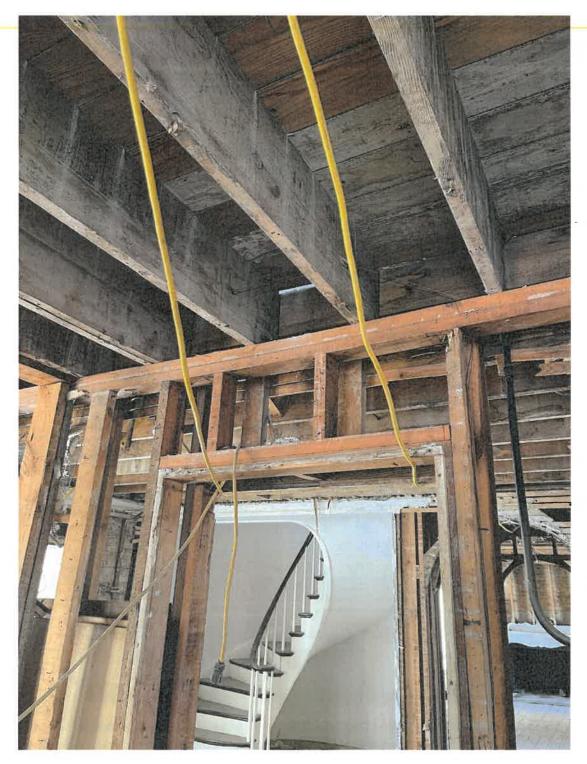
South Wing (First Floor) – Interior bearing wall with no structural header at door opening
